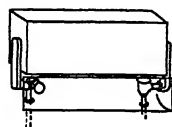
HEATING UNIT VALVES BEHIND GRILLE
